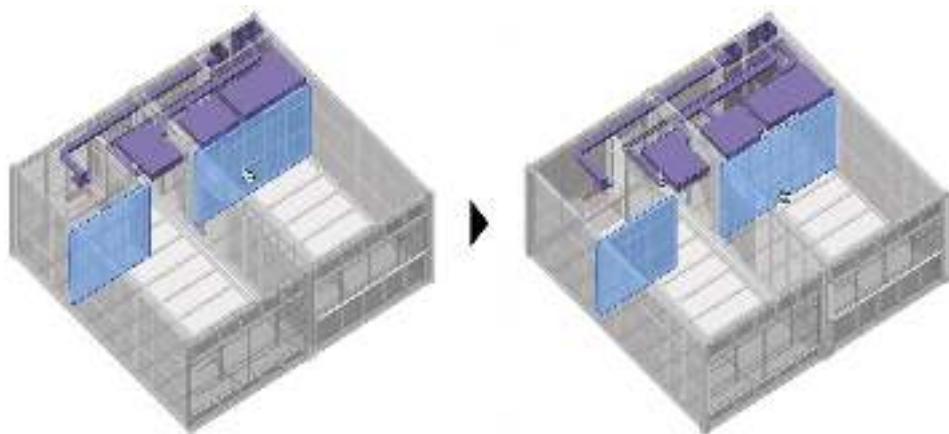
HVAC equipment adjustment according to changes of partition wall. HVAC equipment and connectors could be adjusted when the space is modified by pulling or pushing the partition wall. From Shenzhen XKool Technology Co., Ltd.
